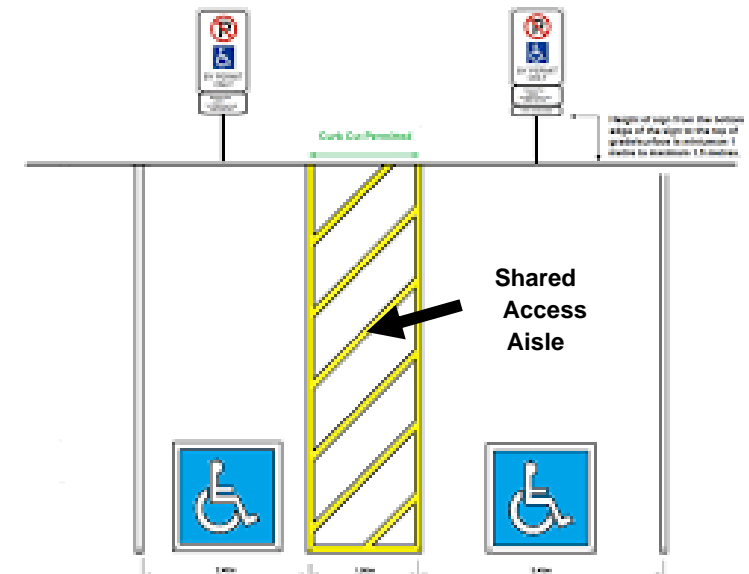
Barrier-Free Parking Space Dimensions – shared access aisle
